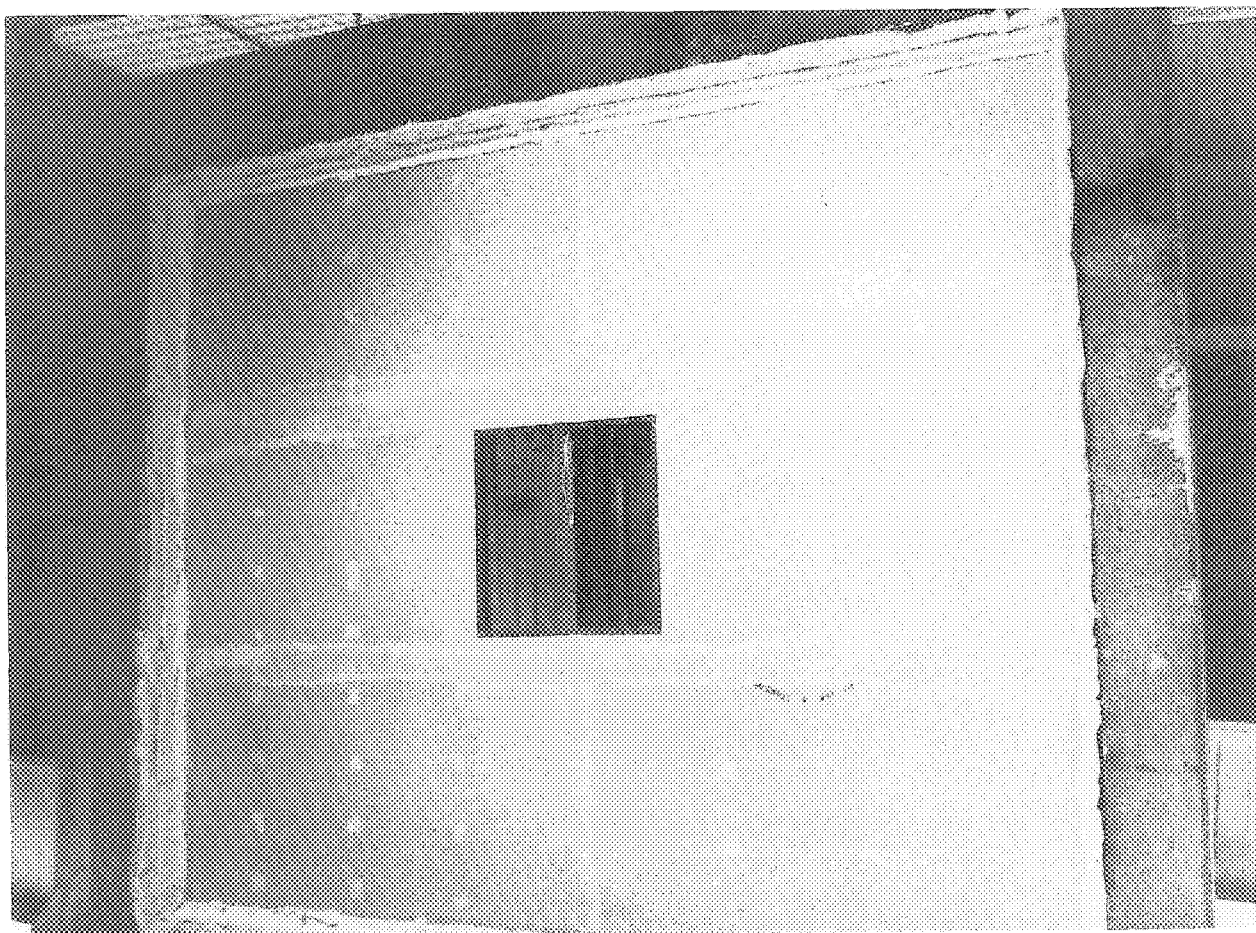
COMPLETED CEILING (ASSEMBLY NO. 2)
